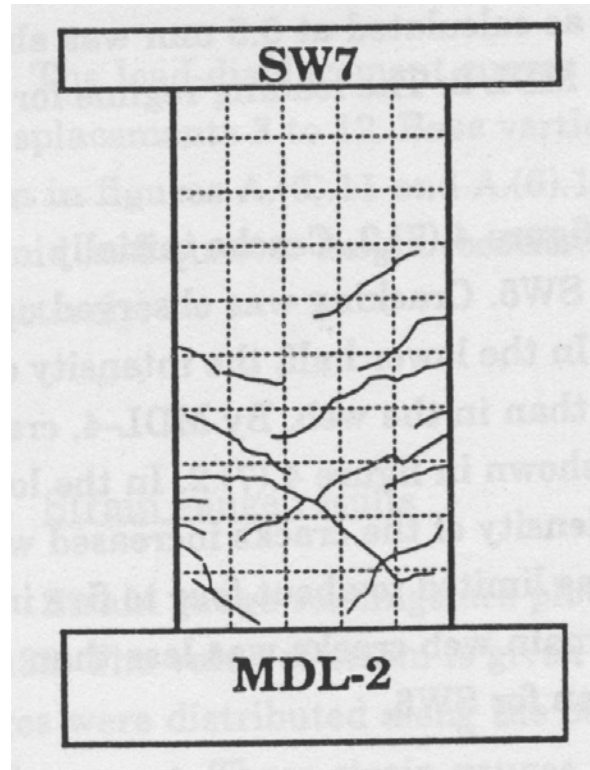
Condition of wall SW7 at 0.17% drift [Pilakoutas (1991)]
